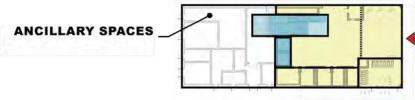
At-Grade Station - Head-house Plan
